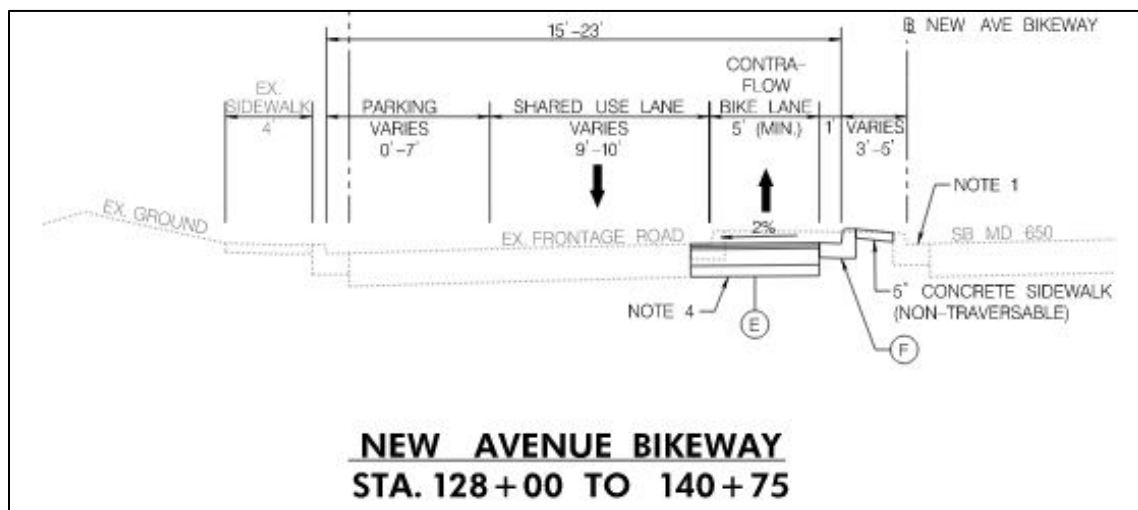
Bike Lane/Sharrow between Kingwood Drive and Sligo Creek Parkway – Proposed Cross Section
